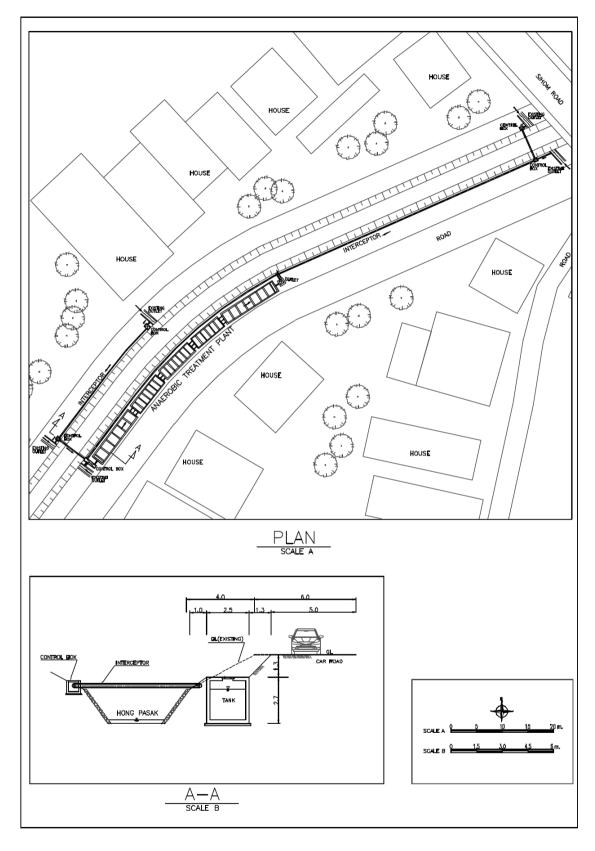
Plan and Typical Cross Section of WTP (T1)
